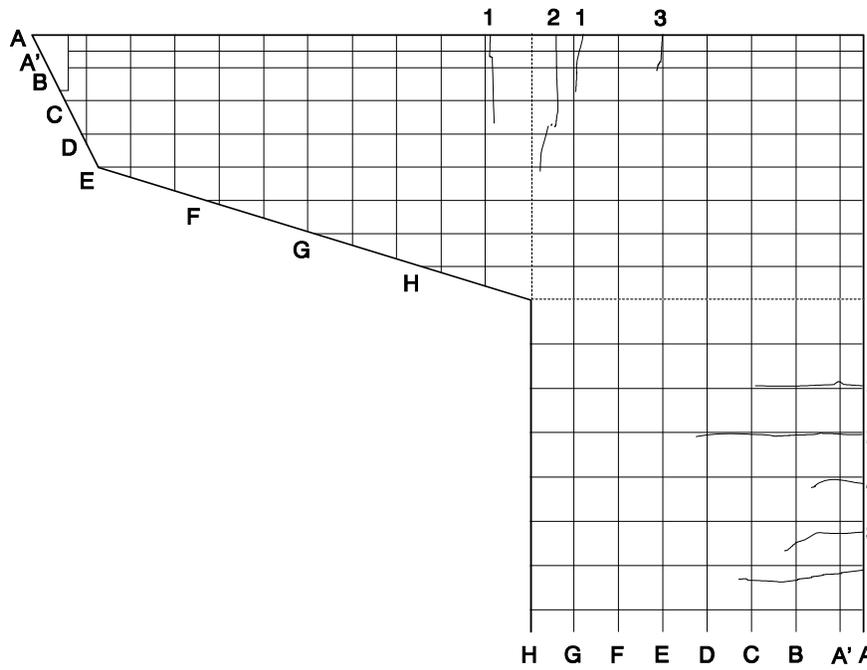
Cracking pattern on south face of Specimen POJ-PU-54-TH at dead load
